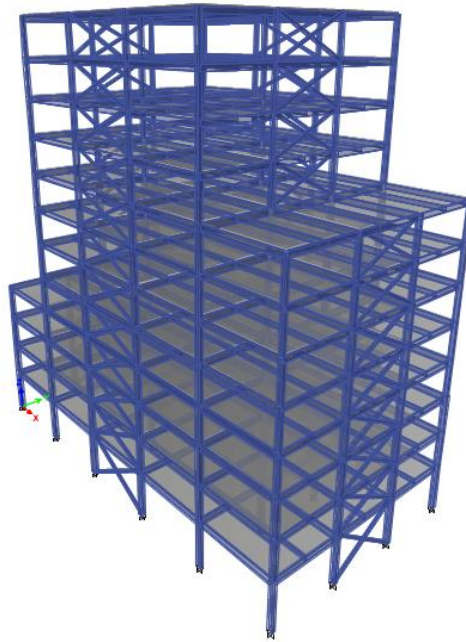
Irregular Height 1Rx1L different elevation building design
